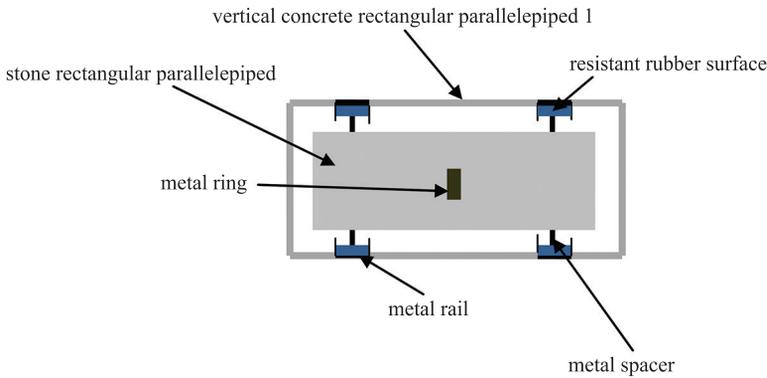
Fixing the rectangular stone parallelepiped to the metal rails – indicative scheme
